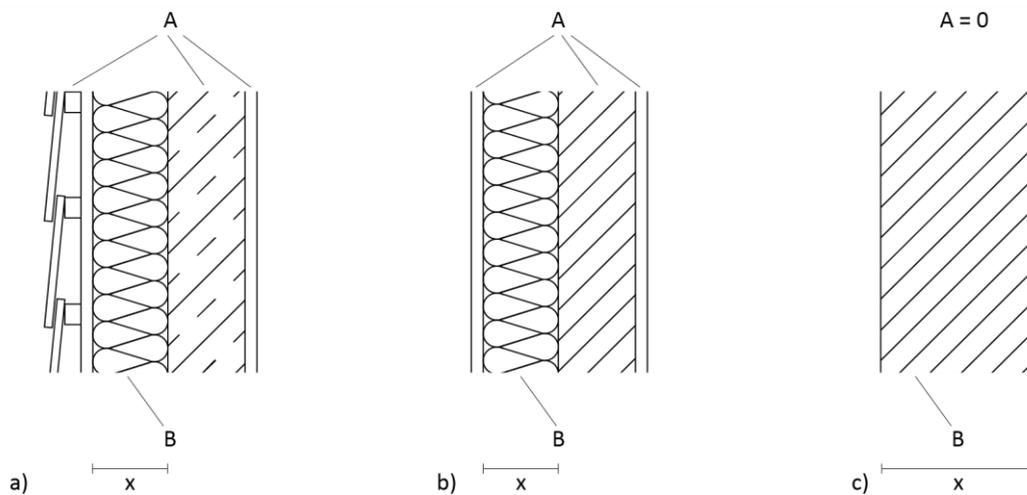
Examples for simplified component input: a) ventilated façade with wooden cladding and reinforced concrete wall, b) External Thermal Insulation Composite System (ETICS) on lime sand stone, c) monolithic light weight concrete
